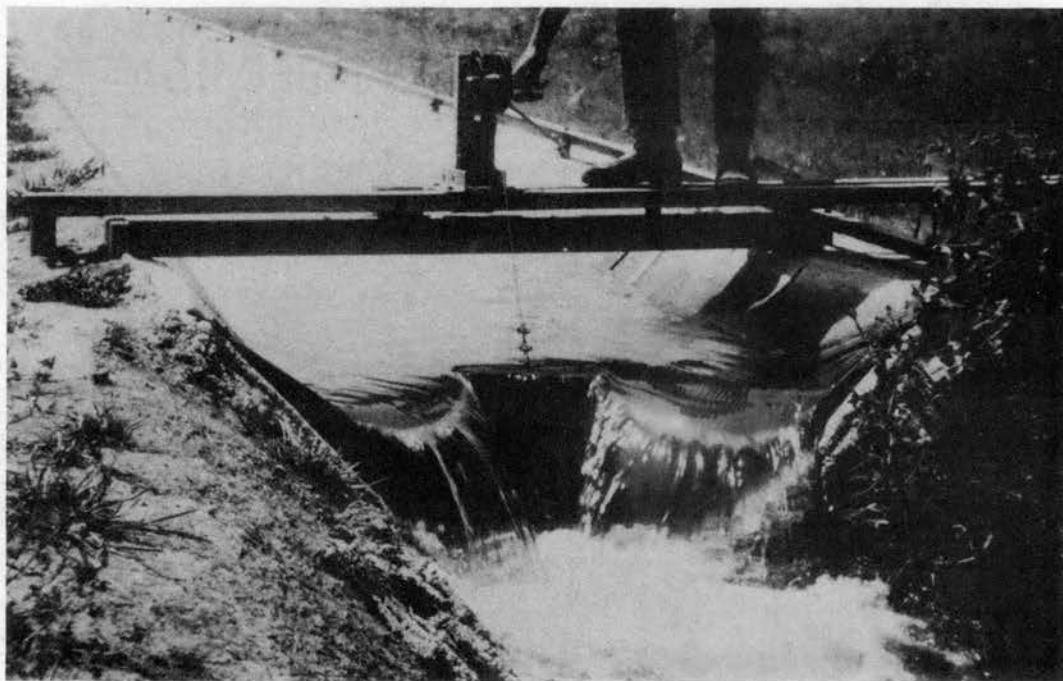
The Check Dam with Cable and Winch Used for Accurate Depth Control.
